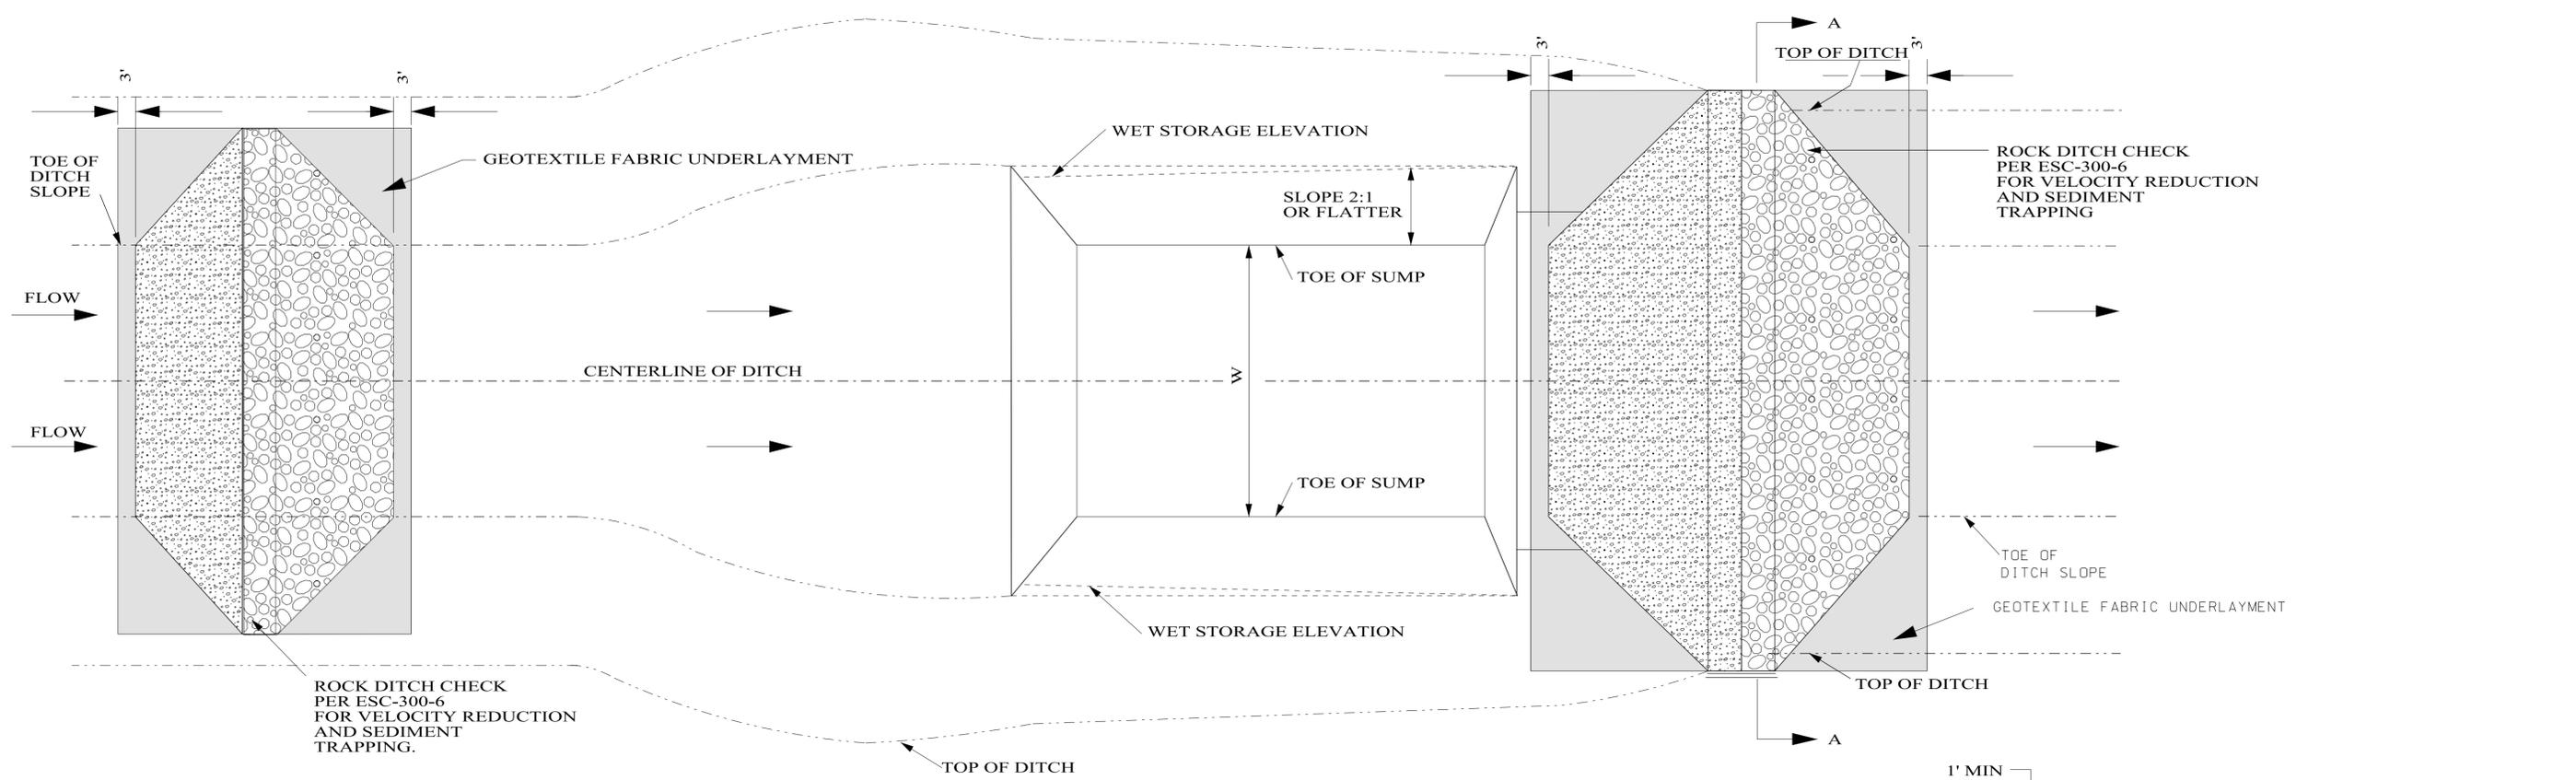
DETAIL FOR SPACING BETWEEN DITCH CHECKS
